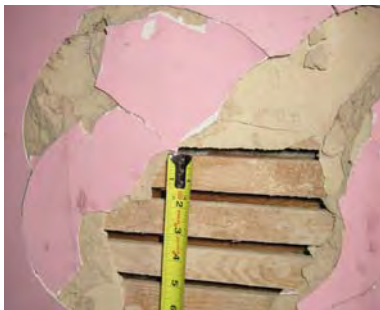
Loss of plaster at north wall exposing wood lath. (Photo: BBB, 2007)
